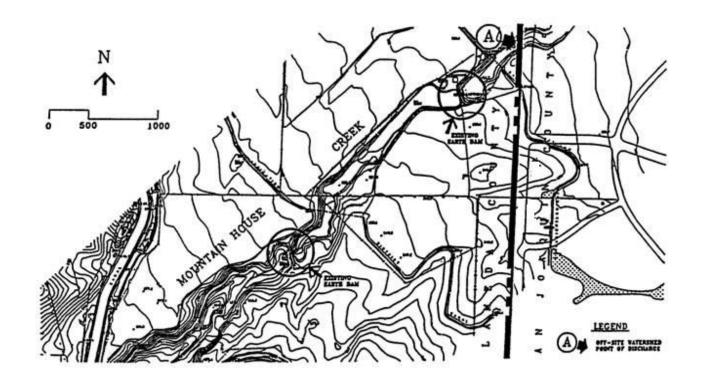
MOUNTAIN HOUSE CREEK OFF-SITE - PLAN
